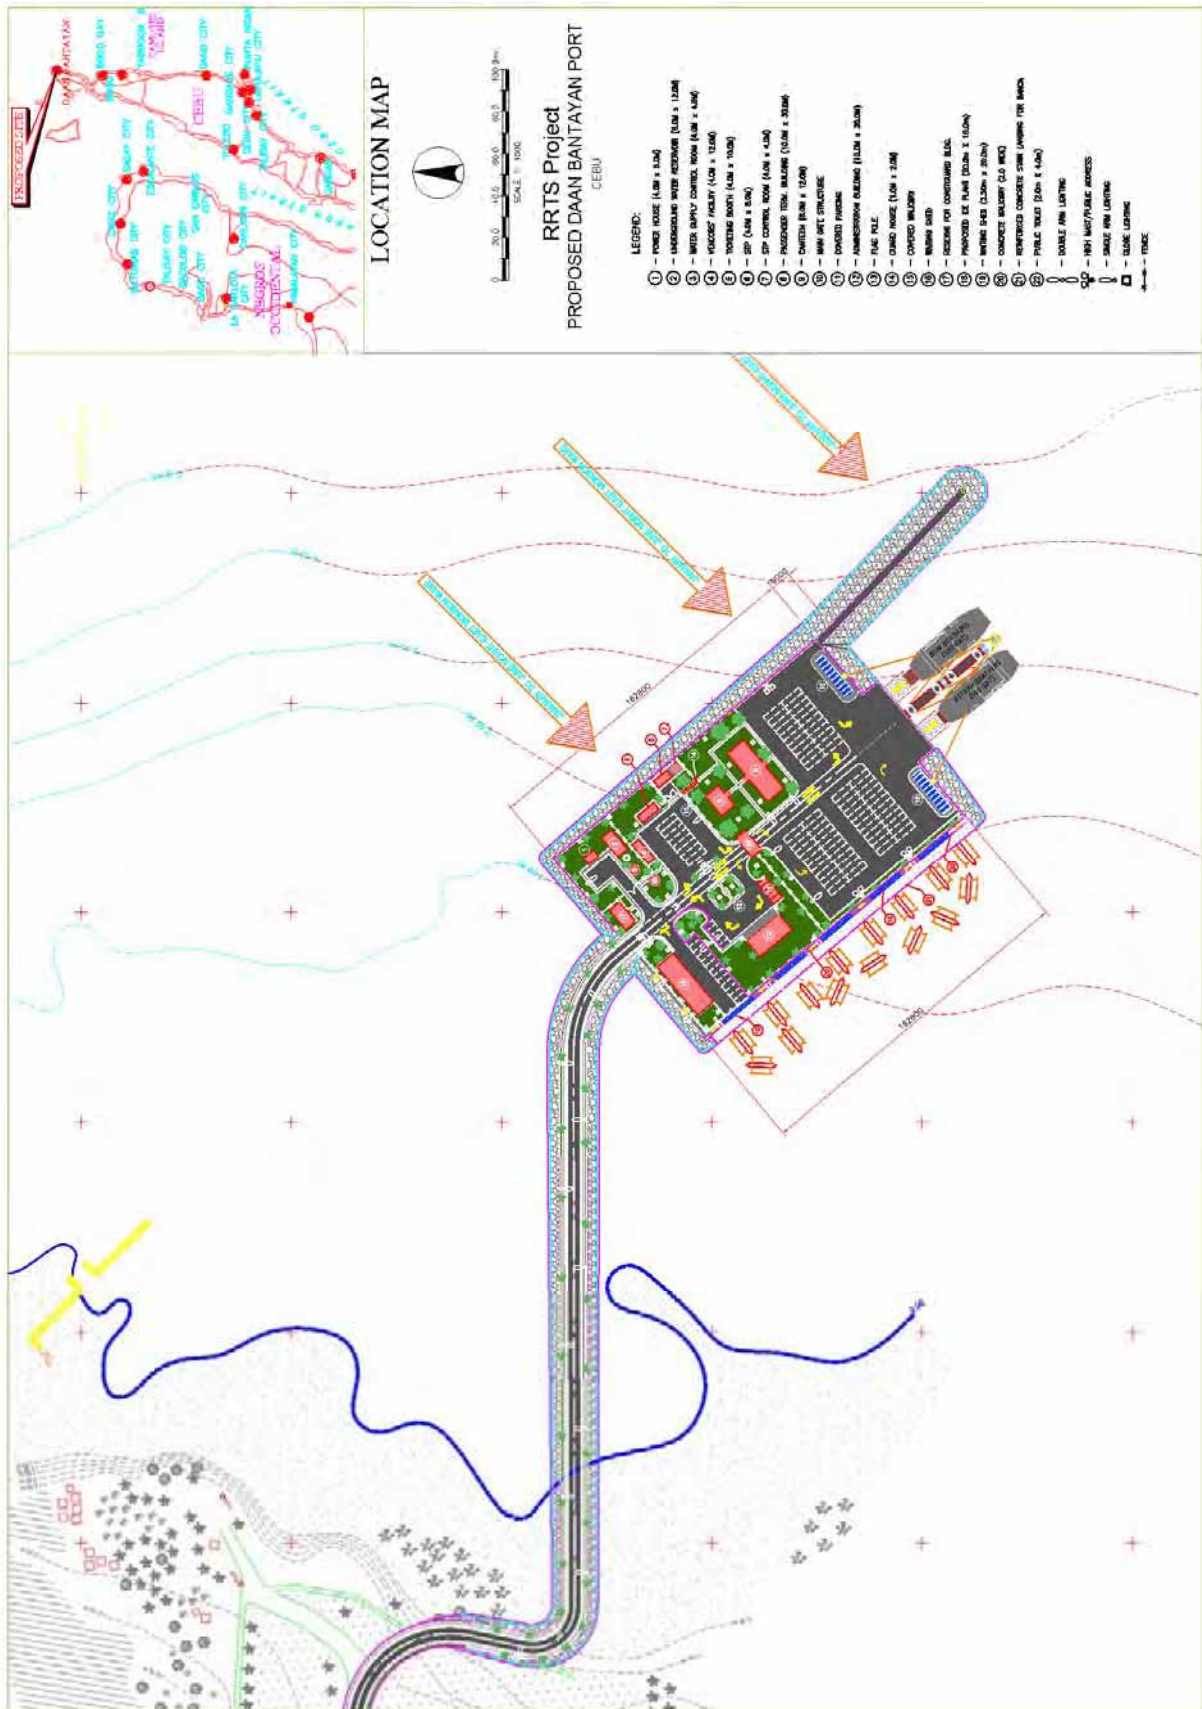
Daan Bantayan Port Terminal Payout Plan
